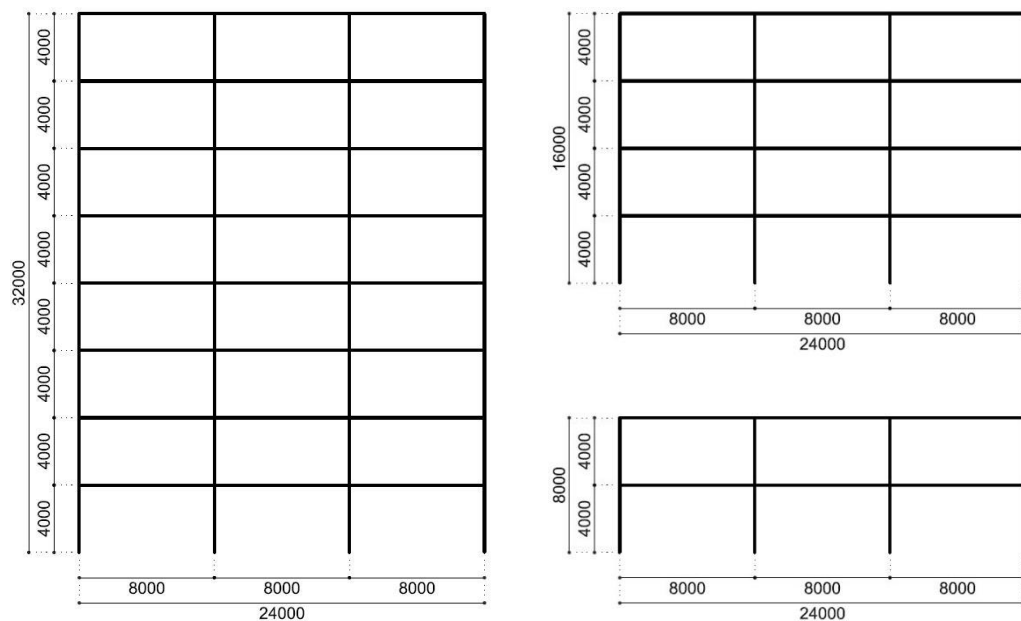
Side-view of the 2/4/8-story archetype structures (dimensions in mm)
